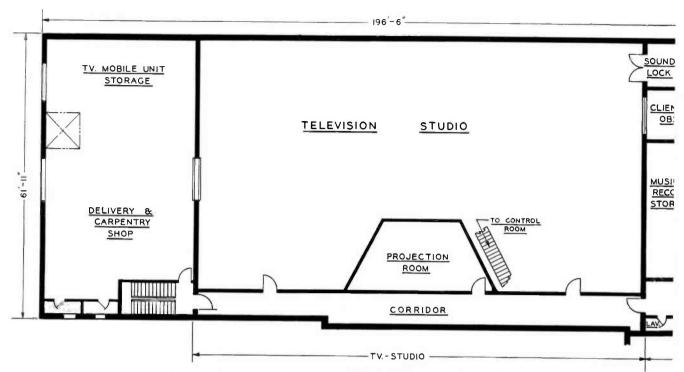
(above). Layout diagram showing arrangement of WDSU-AM/FM and TV Studio facilities.
